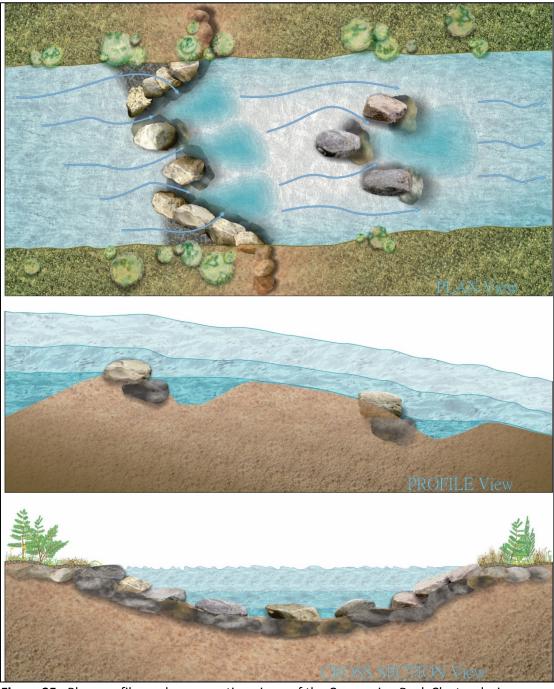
Plan, profile, and cross-section views of the Converging Rock Cluster design.
